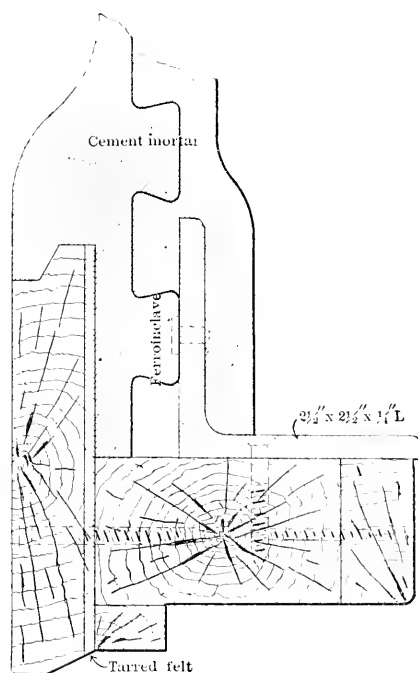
SECTION THROUGH WINDOW LINTEL.
